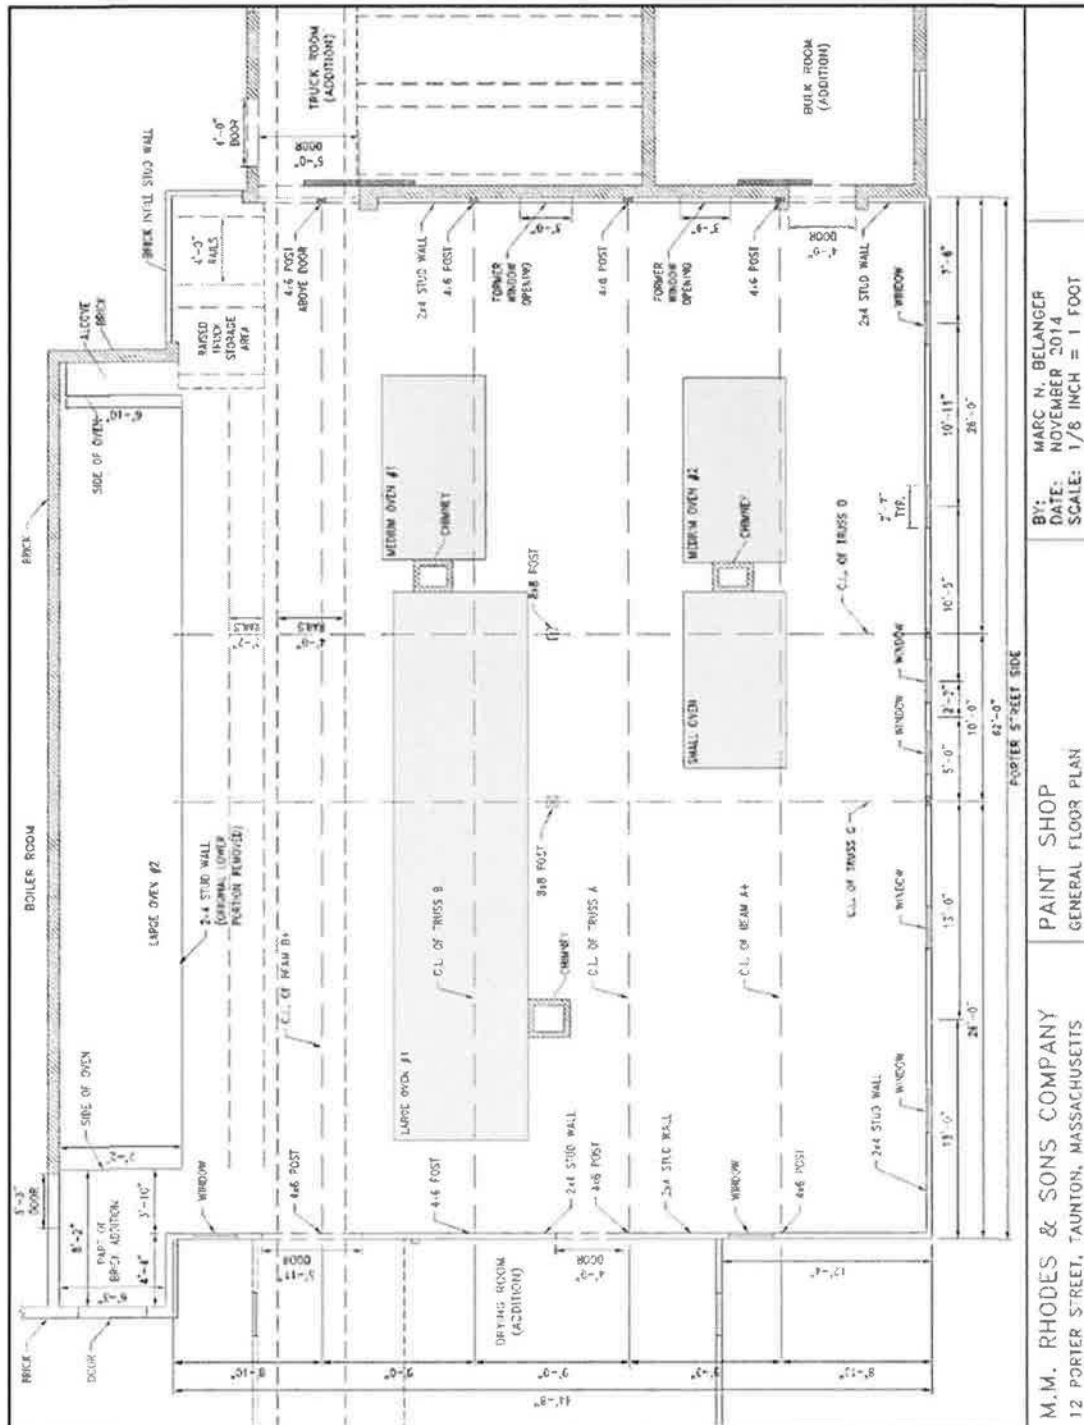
Measured Drawing, Paint Shop General Floor Plan.
